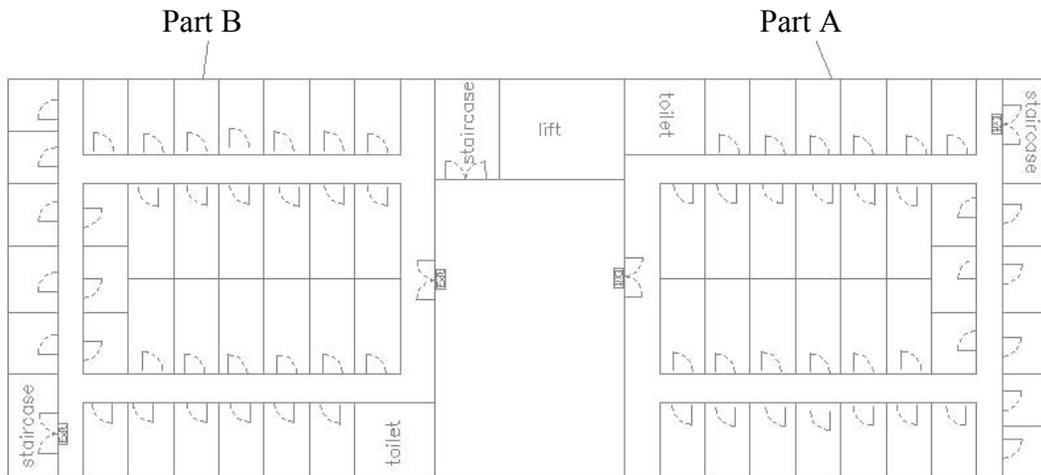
Layout plan of a floor with SDUs in the surveyed industrial building I1 at Kwun Tong
